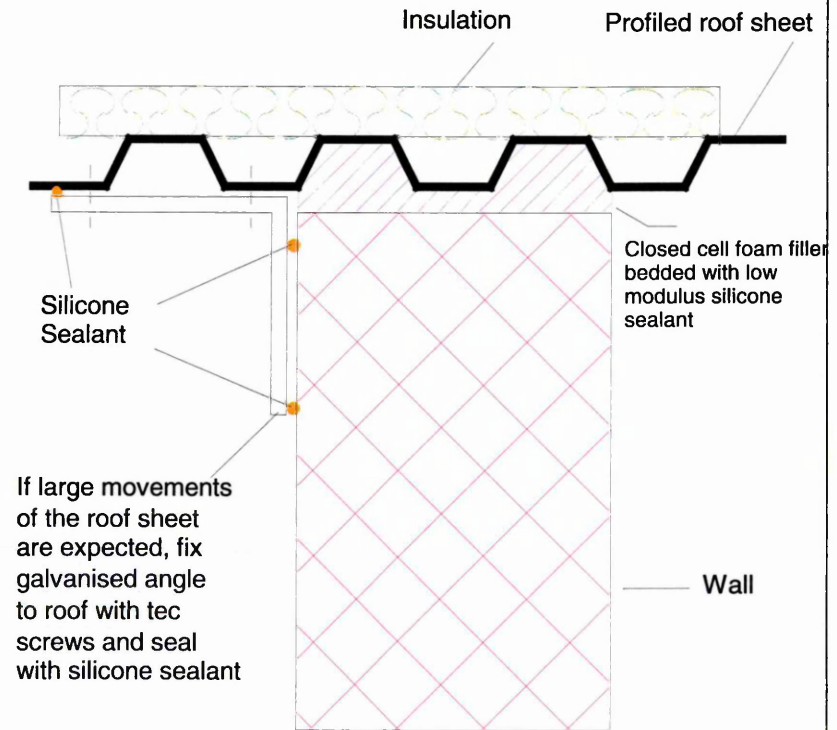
Airseal detail at blockwork wall adjacent to roof sheet eaves detail.
